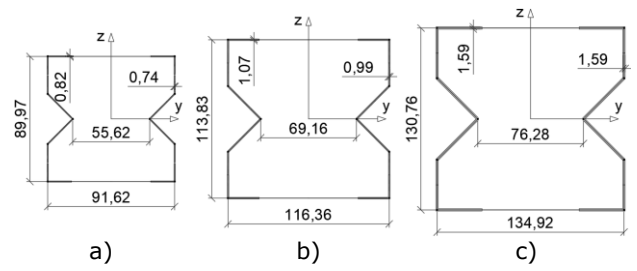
Cross-section geometry of optimized Type B column: a) – column under 50 kN axial load; b) – column under 100 kN axial load; c) – column under 200 kN axial load
